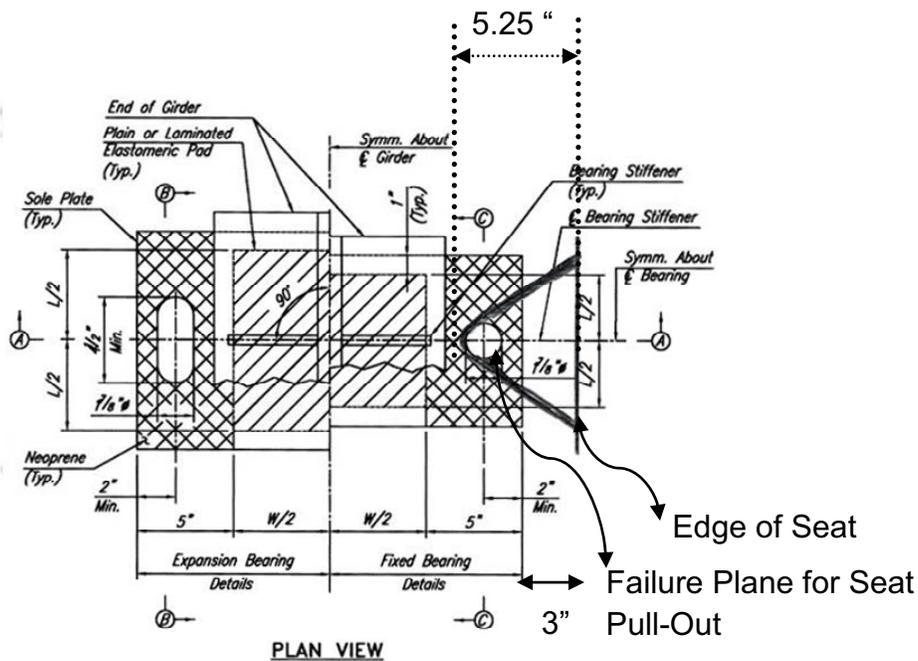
Anchor Bolt Shear Failure Plane
